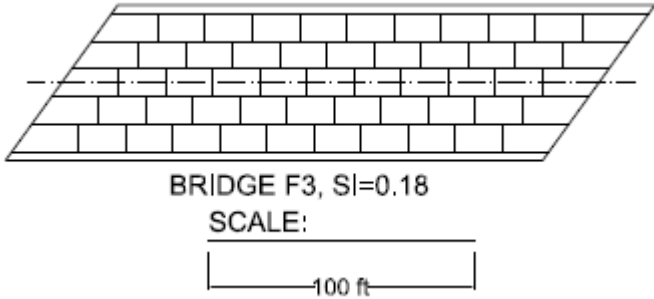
Other simple-span bridges with staggered cross-frame arrangement.
